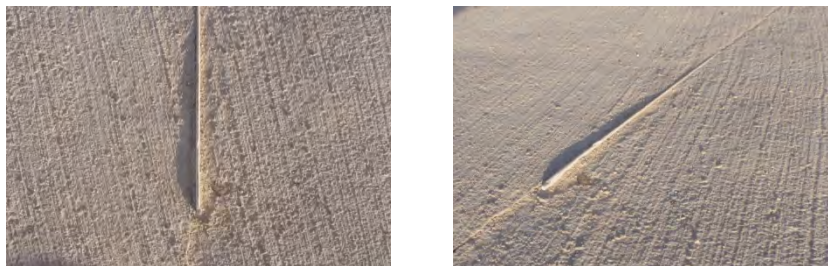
Exposure of crack former, Lampasas River Bridge
